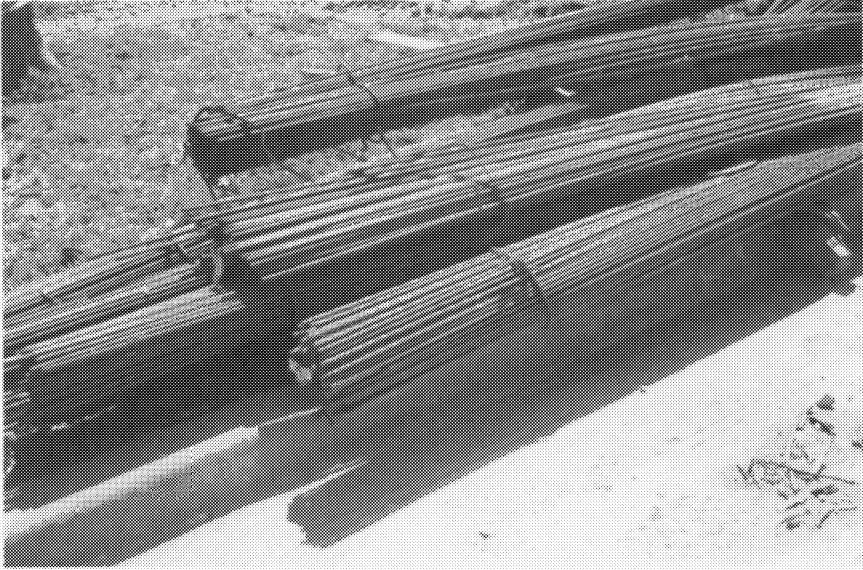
Reinforcing in stock lengths as shipped to the job site.
